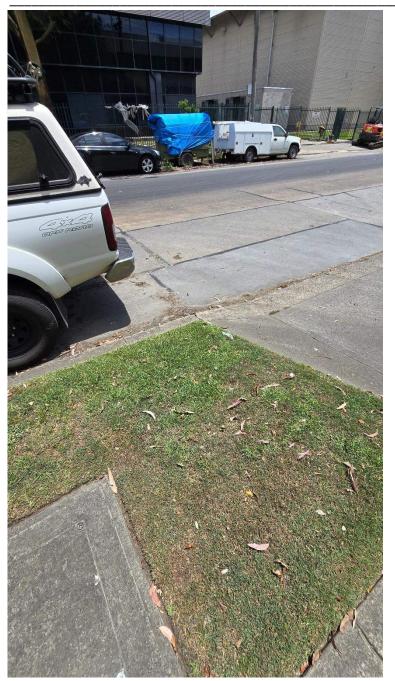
Cracks observed (12, 13, 14) - Large surface breaks road
